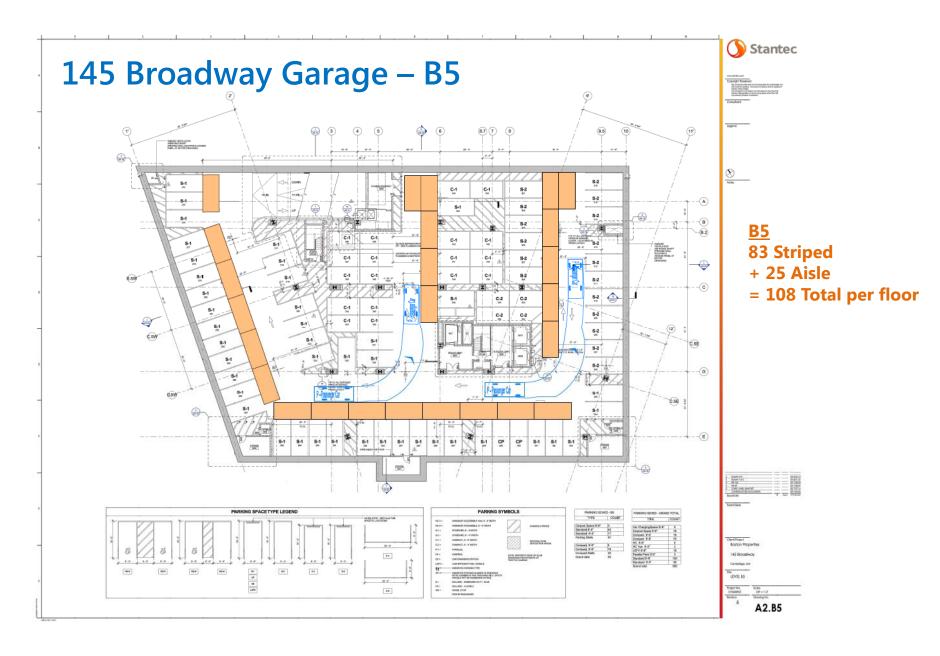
Proposed Layout 145 Broadway Garage (457 Spaces)
